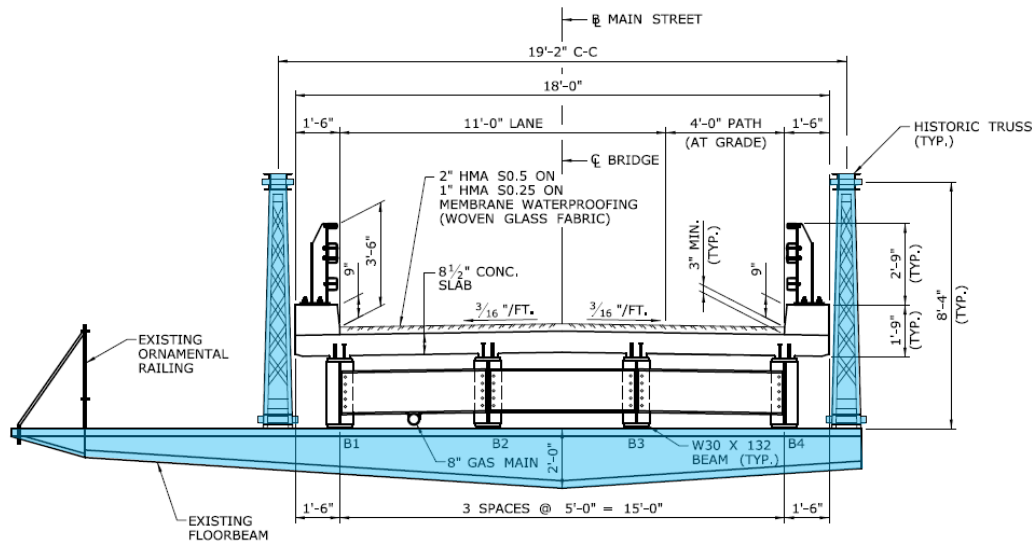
Detail of proposed cross section of rehabilitated Bridge #04575. The original truss members and girders (highlighted in blue) will be retained while a new superstructure will replace the 1985 system. Note that the new girders are installed just above the original beams. However, these two systems are independent and do not touch or bear on each other
